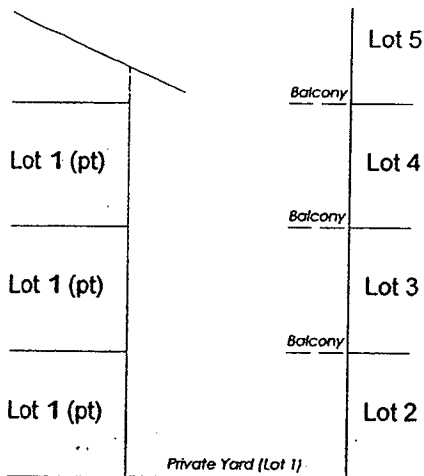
Private Yard unacceptable, as the balconies of lots 2 to 5 are above it. It would be acceptable if the extent of the private yard was less than the projection of the balconies.
